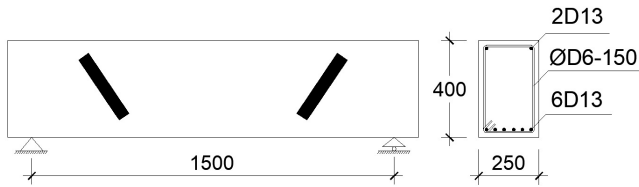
The cross-section of strengthened beam specimen, B1 (units in mm).
